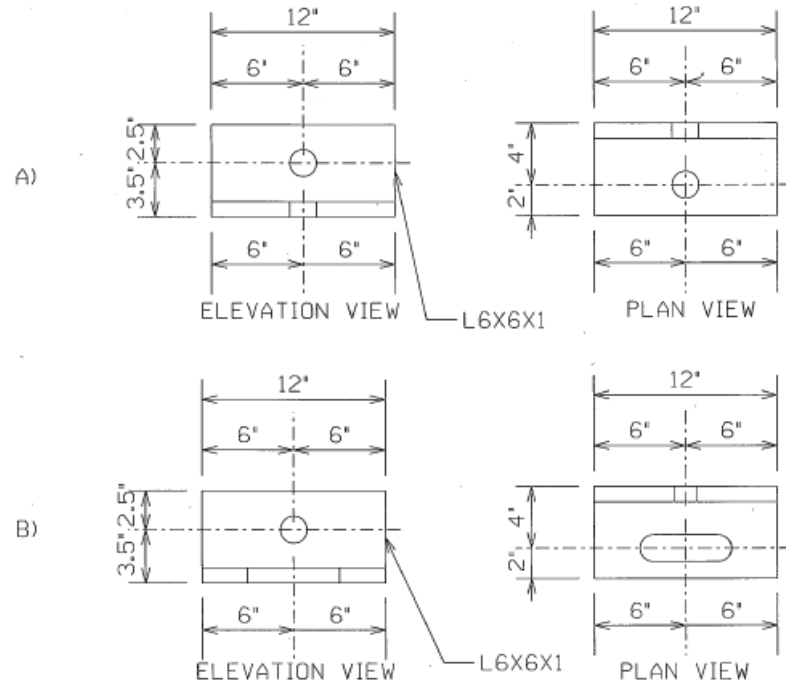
Little Bear Creek Bent 2 & 3 Connections for Bulb Tee Girders
